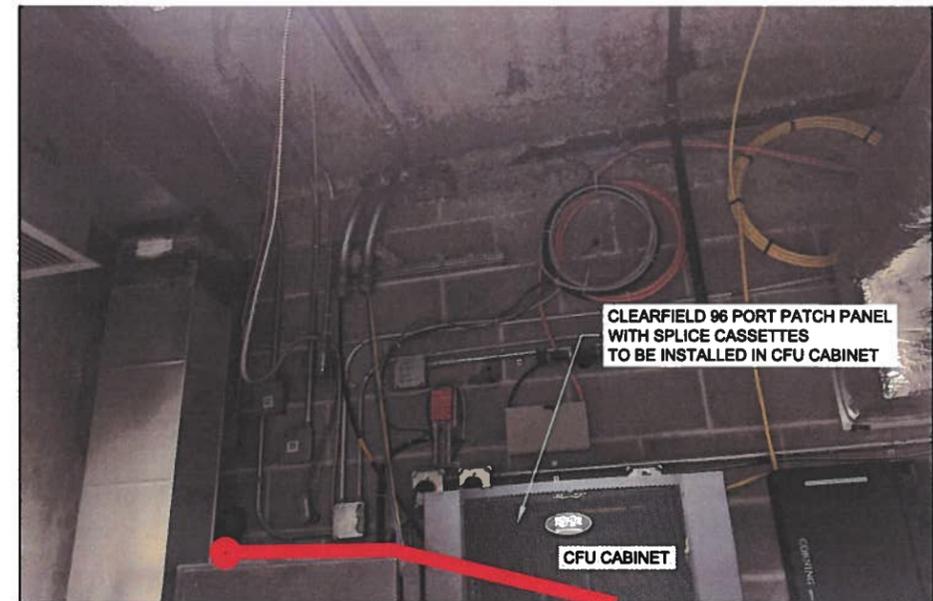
PROPOSED WALL PENETRATION INTO SERVER CABINET ROOM ON SOUTH WALL. (FACING SOUTHEAST) - SECTION E-E
